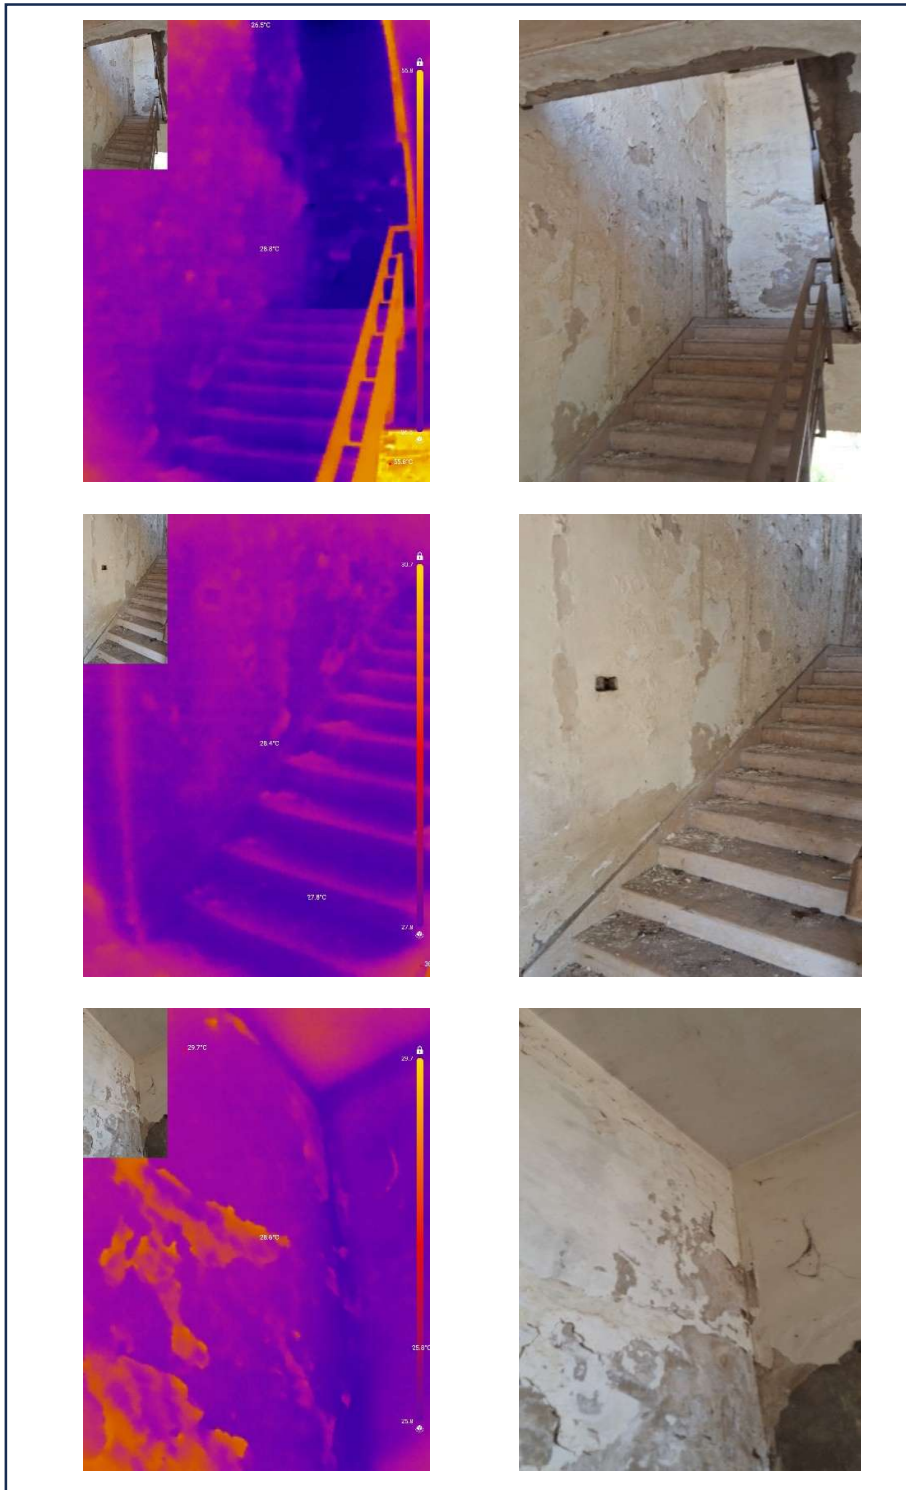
sseepage from the external wall face and the headroom slab due to gravitational flow has been present for a prolonged period, leading to progressive deterioration of the wall and steps.
